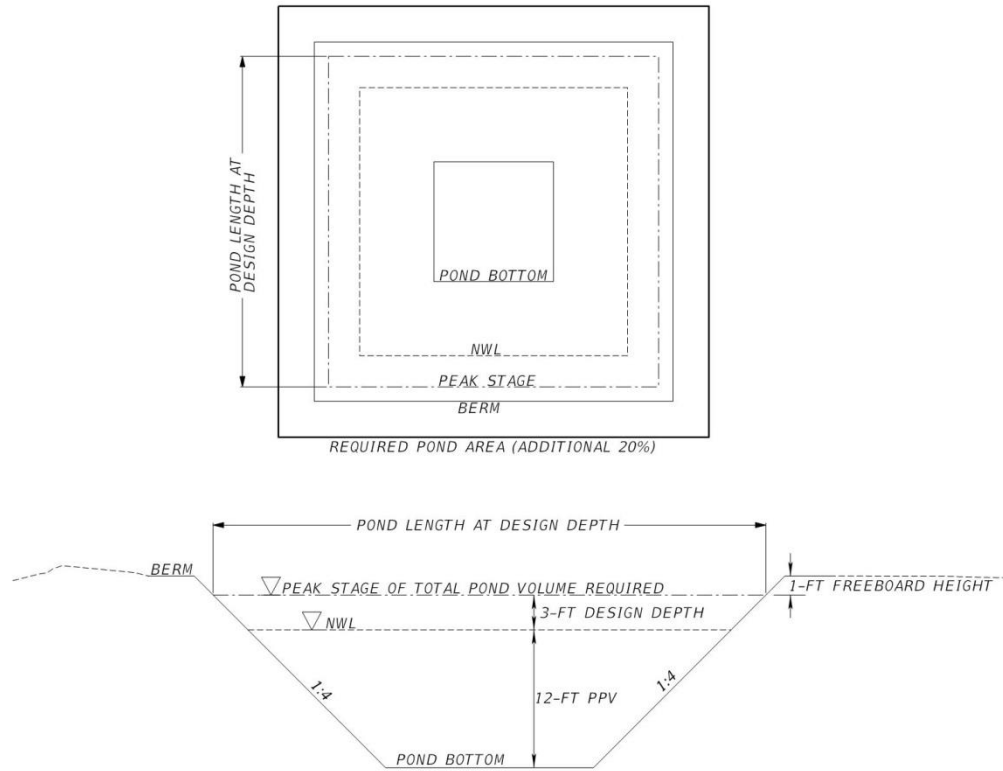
POND SIZING TYPICAL SECTION (NOT TO SCALE)
